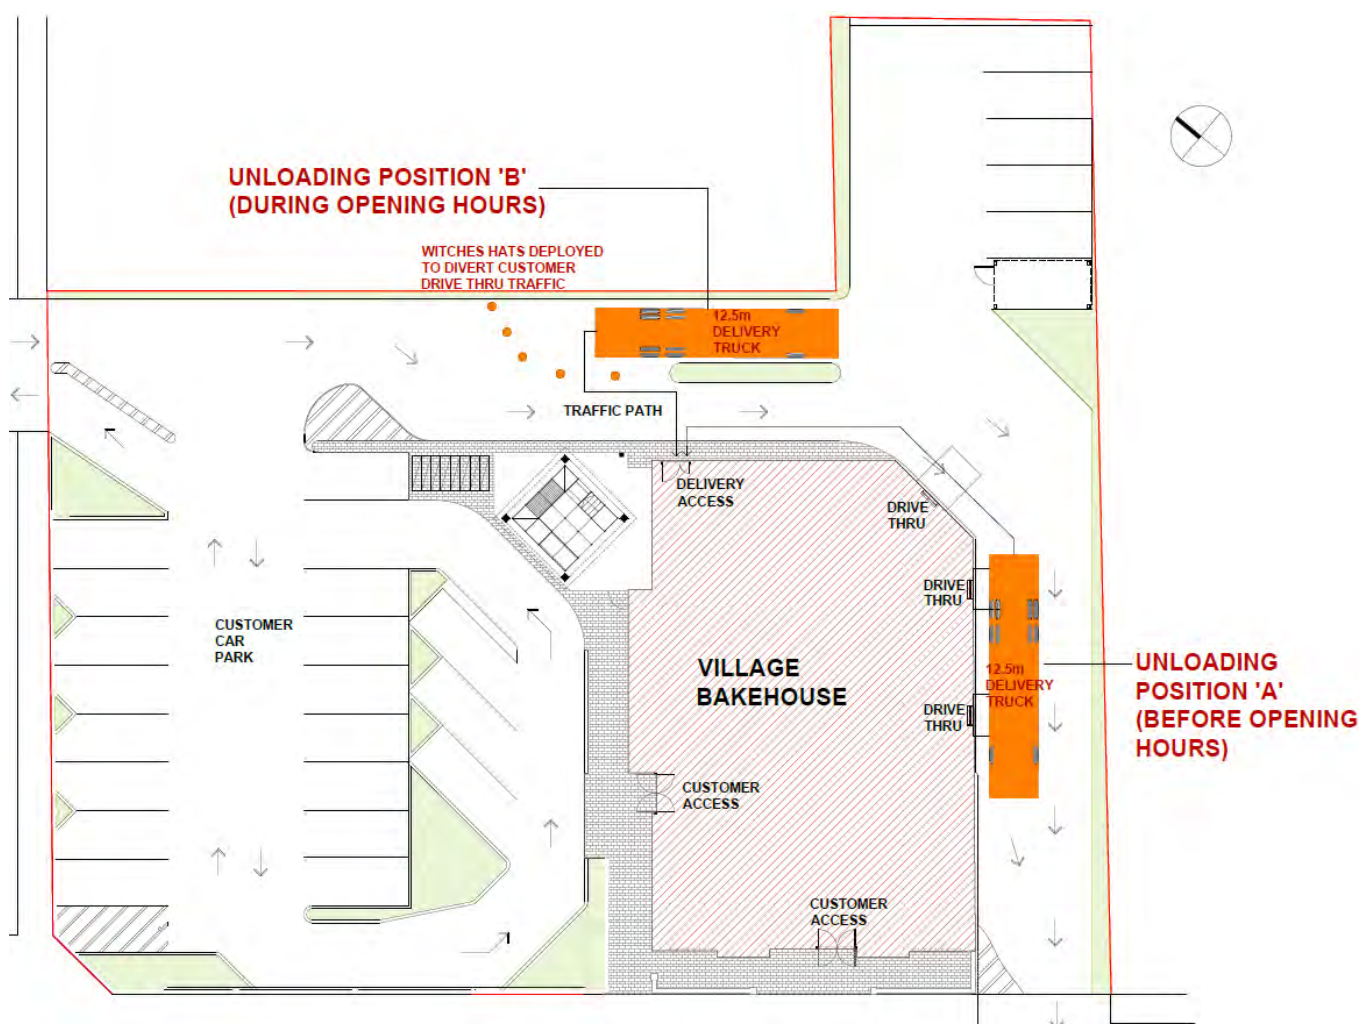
Service Vehicle Loading/Unloading Layout Plan
